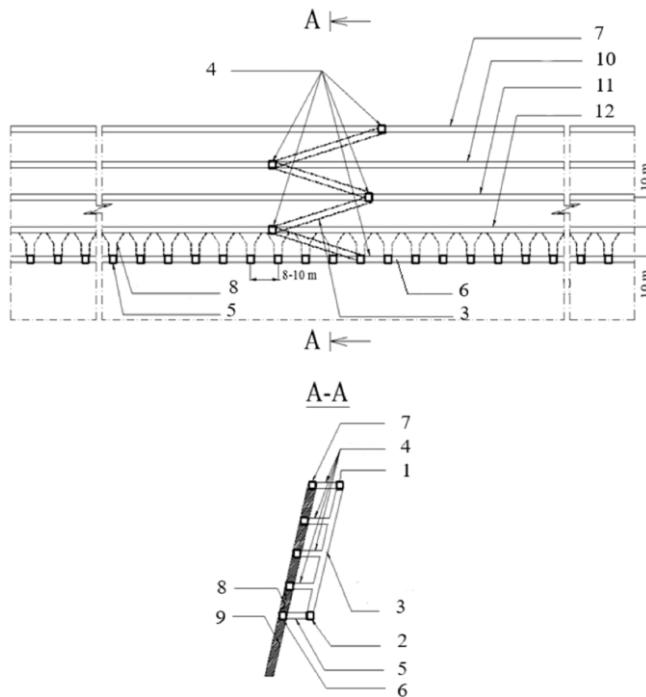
Diagram of the preparation of the mining room in the design area: 1 – ventilation level at +110 (in floor); 2 – haulage level at +70 (in floor); 3 – inclined tunnel connecting +70 to +110 levels; 4 – cross-measure drifts; 5 – cross-measure drift (ore discharge); 6 – haulage level at +70 (in ore body); 7 – ventilation level at +110 (in ore body); 8 – ore chute; 9 – ore body; 10 – stratified longitudinal level at +100; 11 – stratified longitudinal level at +90; 12 – stratified longitudinal level at +80
